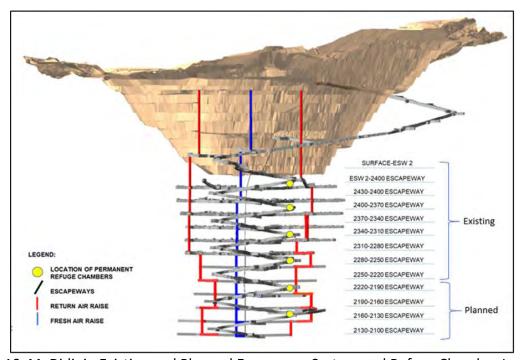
Didipio Existing and Planned Escapeway System and Refuge Chamber Locations
